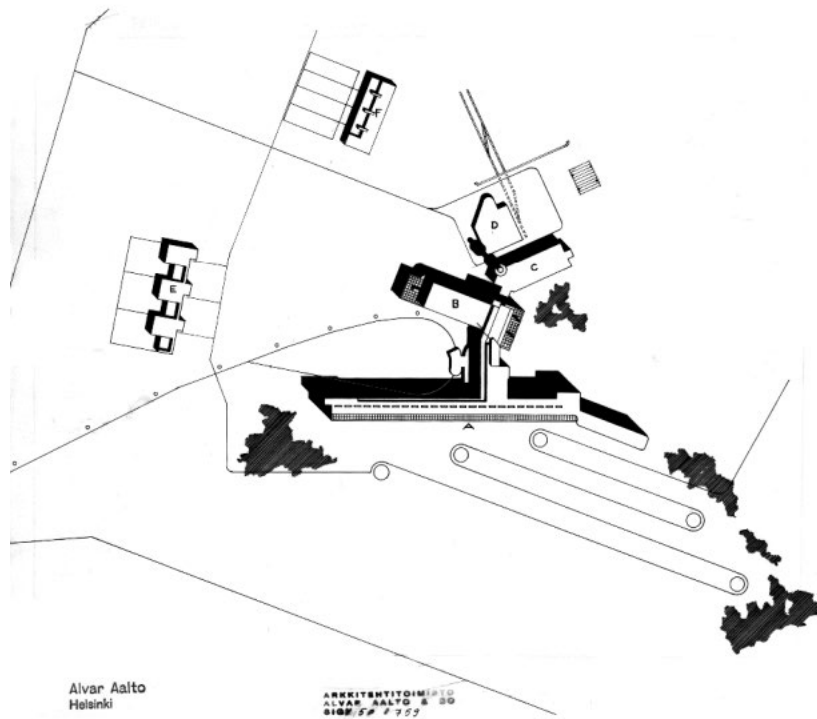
Site plan showing main building and it's wings (A-D), the Junior Physicians' and Administrative Director's house facing the hospital entrance (E) and workers' apartment building (F). Detail of drawing No. 50-759, the drawing has been edited. Alvar Aalto Museum. Material used for educational or research purposes permitted.
